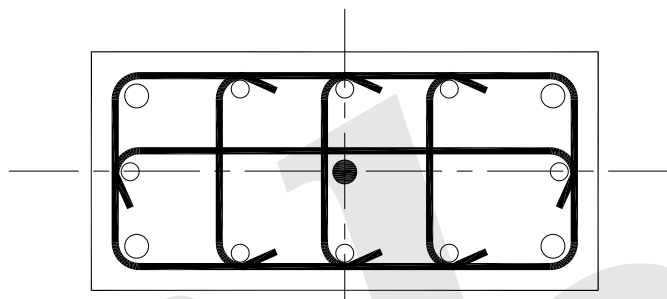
Central bar at bottom connection – The perimeter reinforcement is curtailed at the bottom of the column and a central large diameter bar completes the connection.
